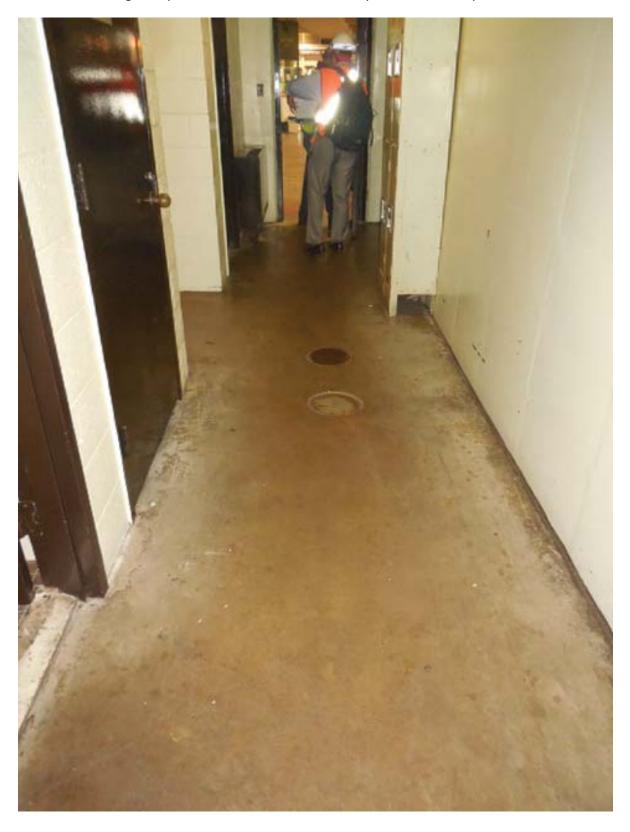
C10 Reagan Airport South – Panel SLE in Room C116
